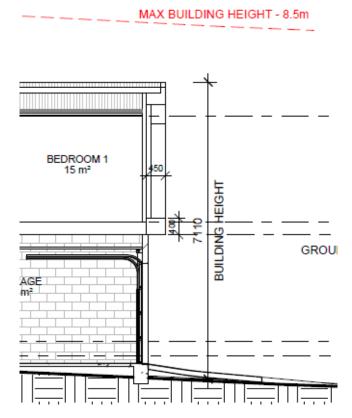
Extract of the architectural plans (Elevations) showing the proposed height of the dwellings
